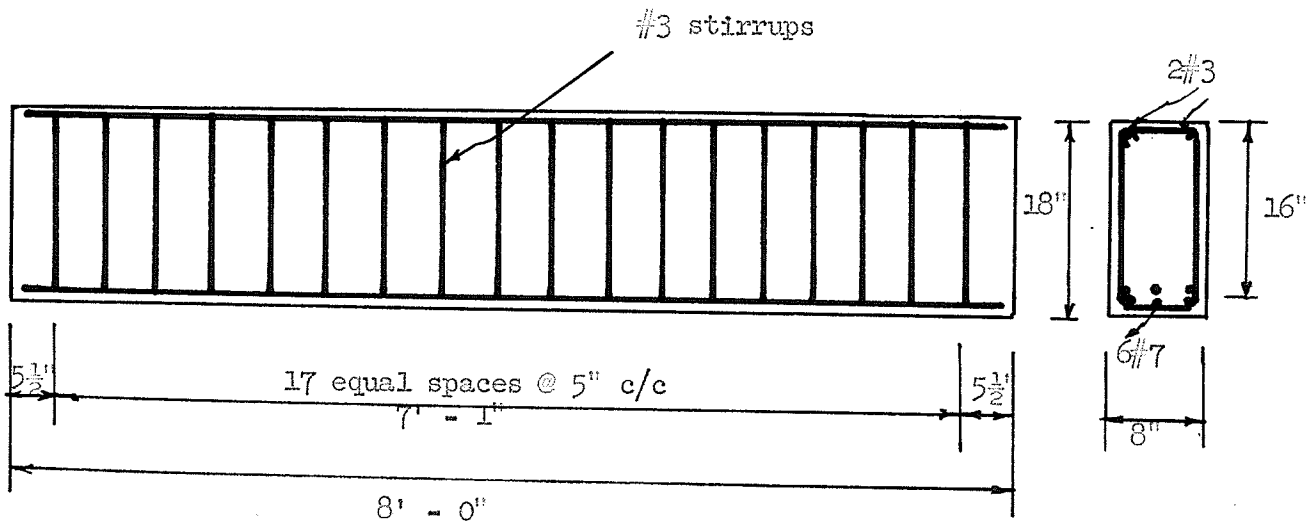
SKETCH OF REINFORCEMENT BEAM 2
